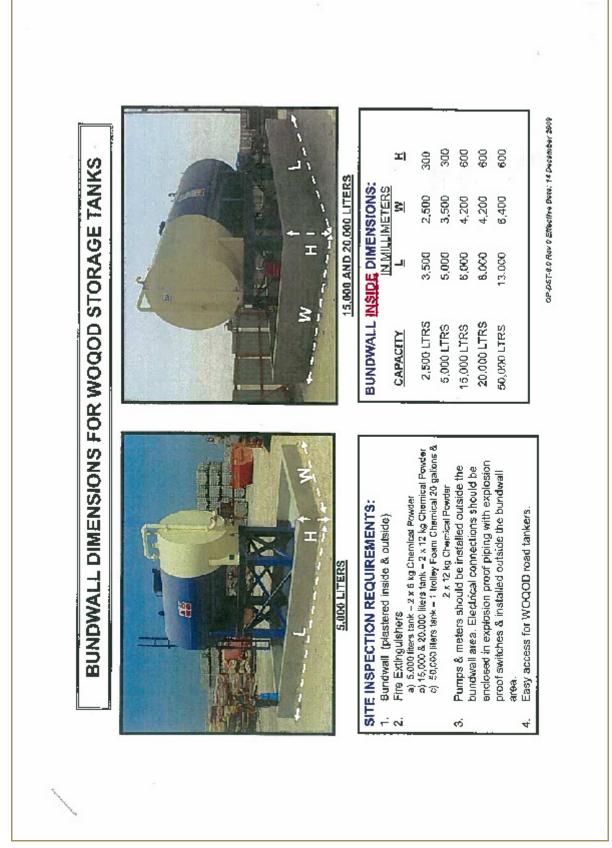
Bund Wall Dimensions for WOQOD Storage Tanks
